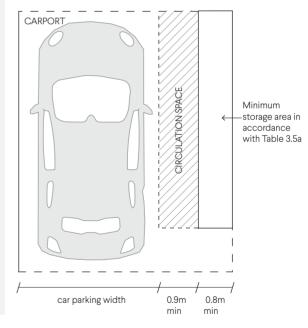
Minimum storage dimensions with adjacent circulation space
